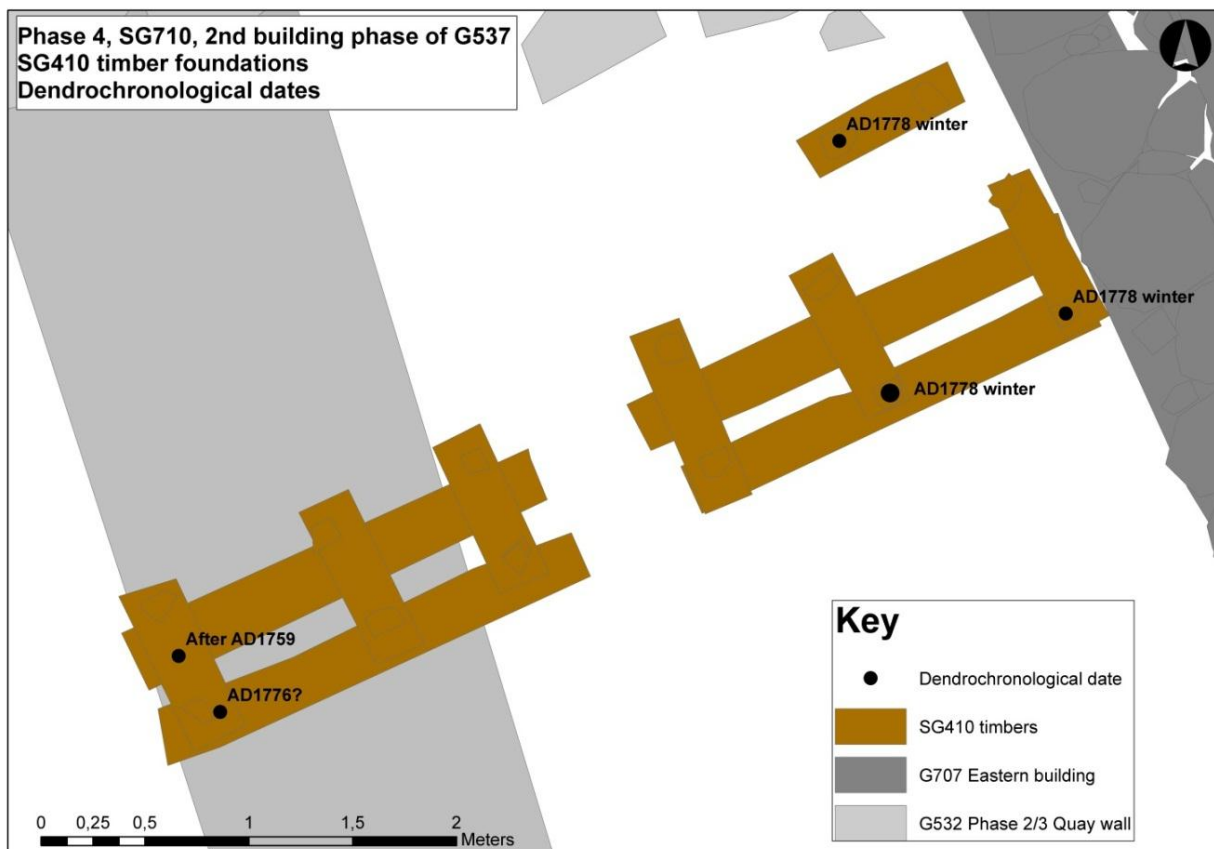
Plan of parts of the possible Vragerbros building (G537). Timber groups relating to the second construction phase of the building.
